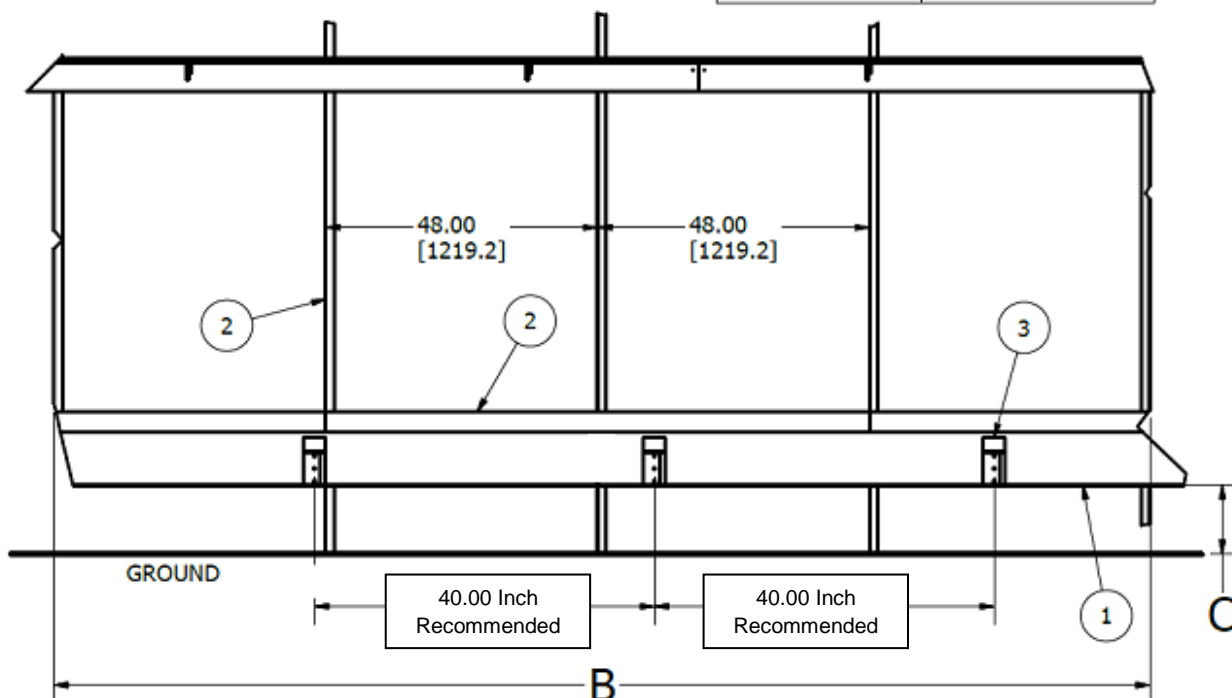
above shows the typical spacing for 2”X4” studs during framing along with typical spacing for the Trough Support Brackets (If Applicable). Table B and Table C provide the total framed opening requirement and minimum distance from the ground to the base of the Trough Support Bracket respectively.
